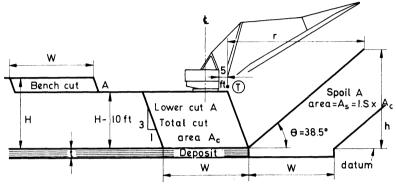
Dragline cross-section.⁽¹⁰⁾
